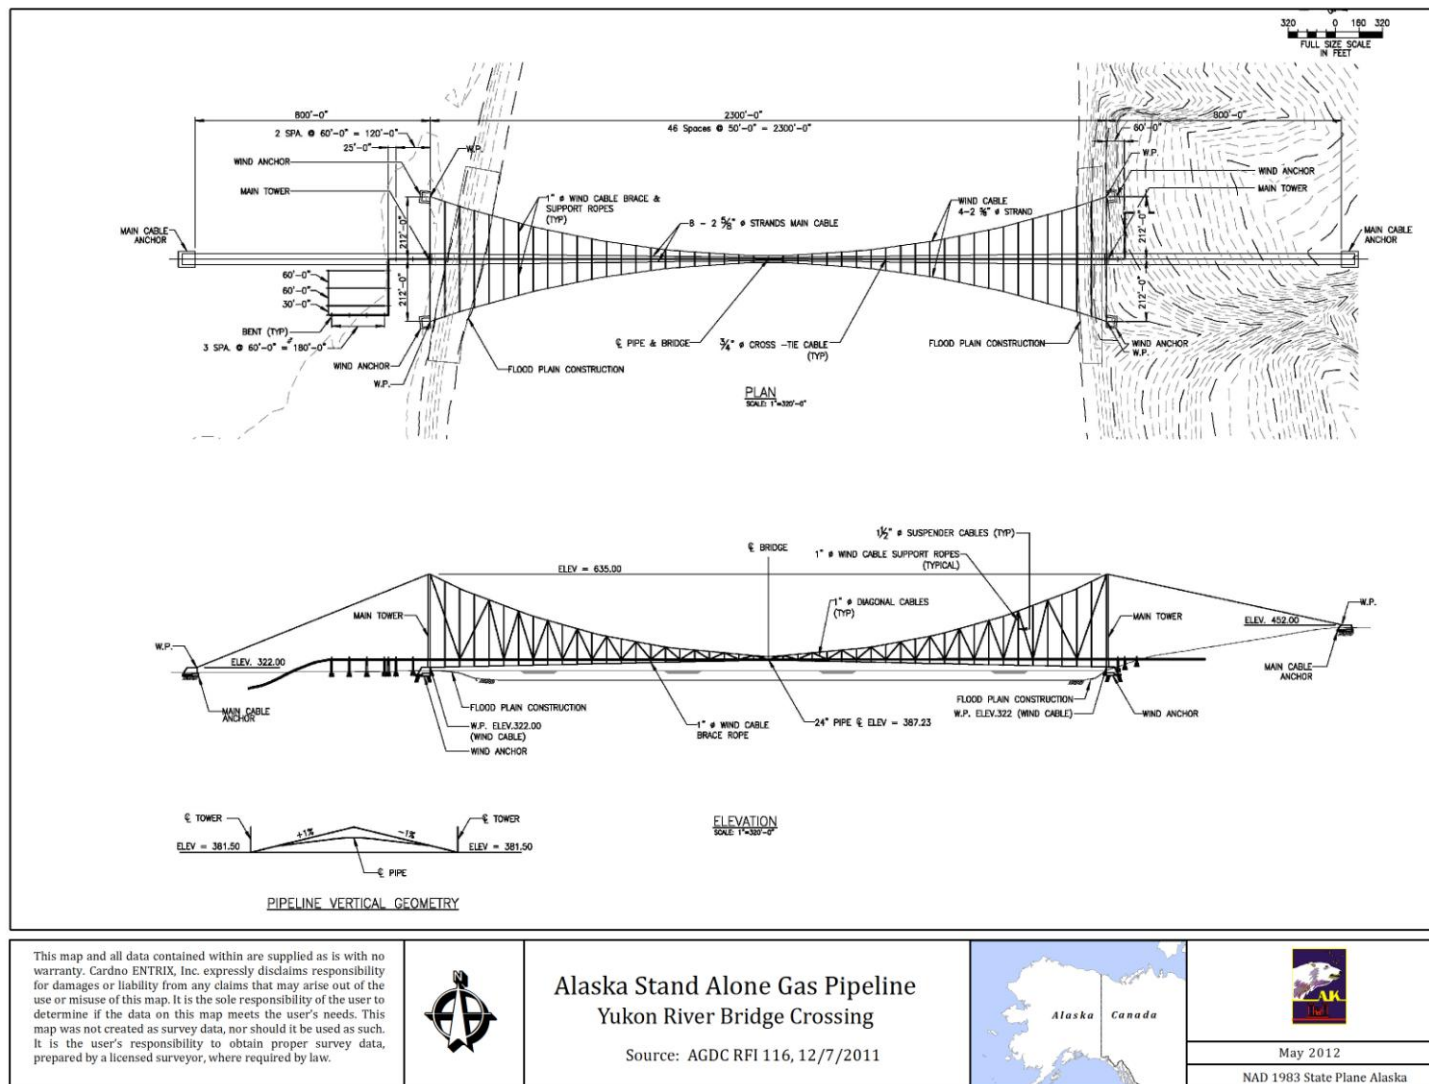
Yukon River New Bridge Crossing (the Applicant's Preferred Option)
